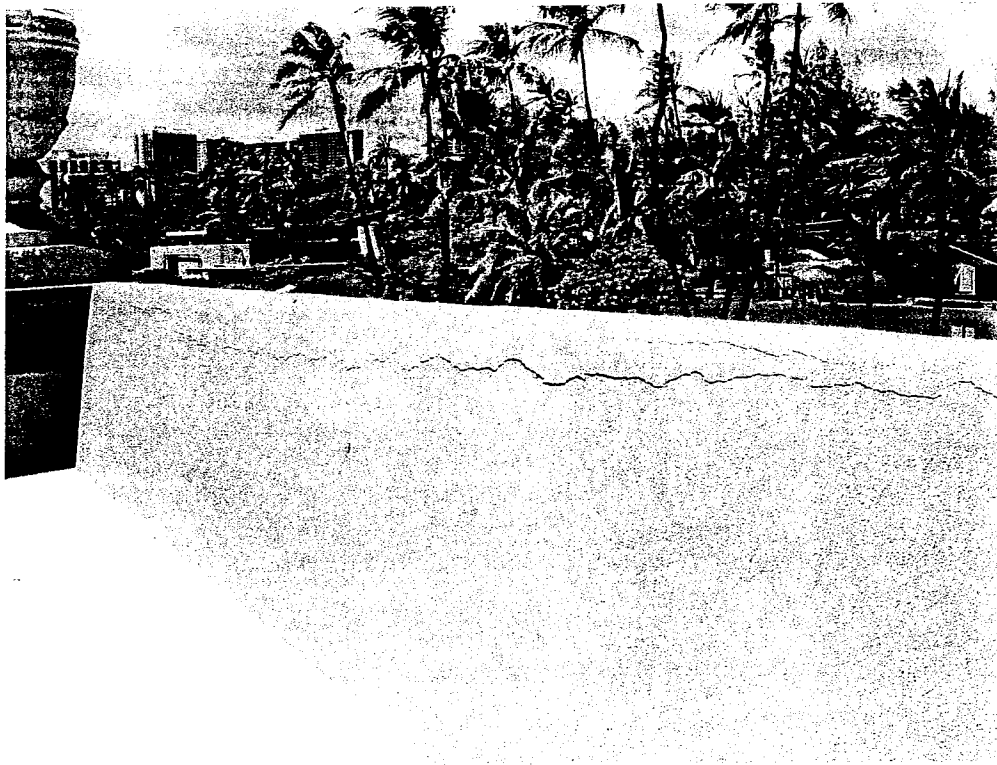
Cracking at Top of Bleacher Seating Wall Finish 2
